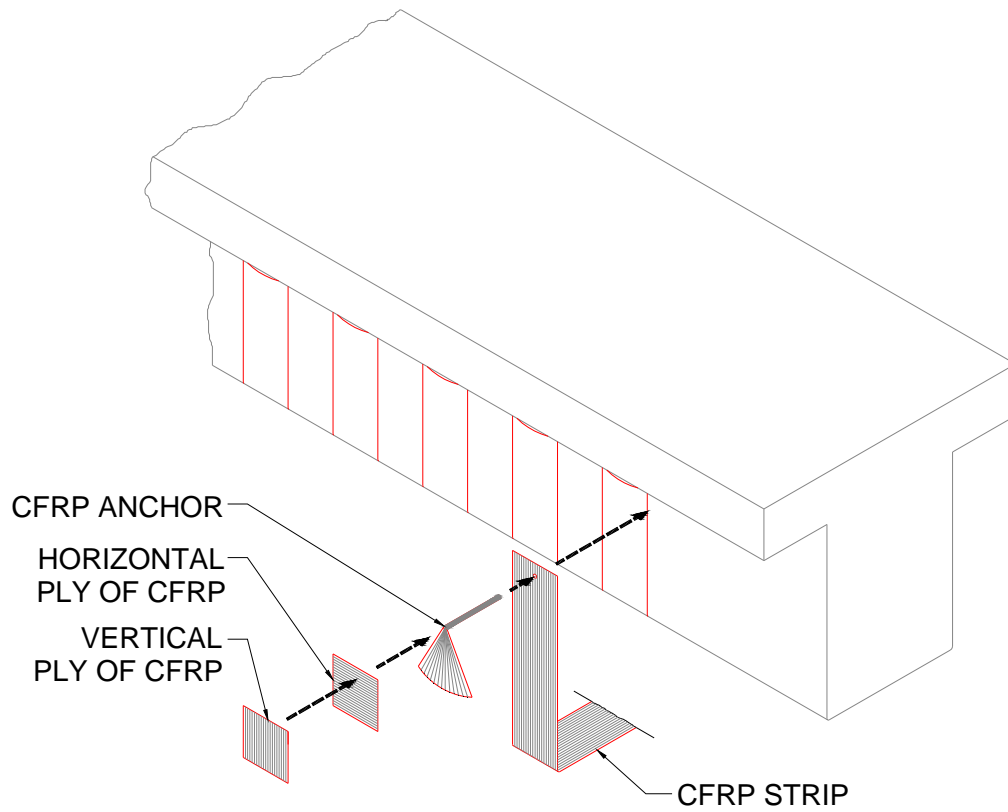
Schematic diagram detailing minimum overlap of the CFRP anchor
